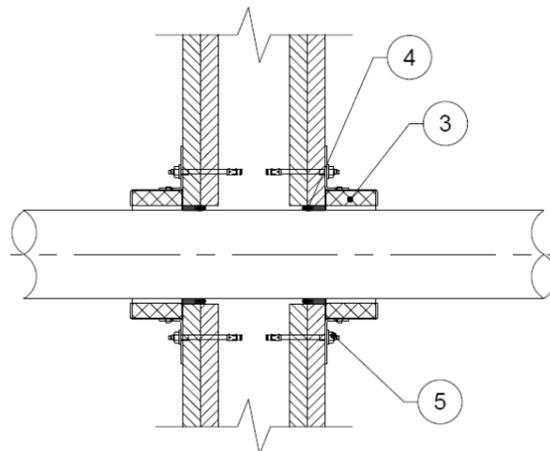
Sealant detail around uninsulated pipes in plaster board walls and Dintel walls option 1
